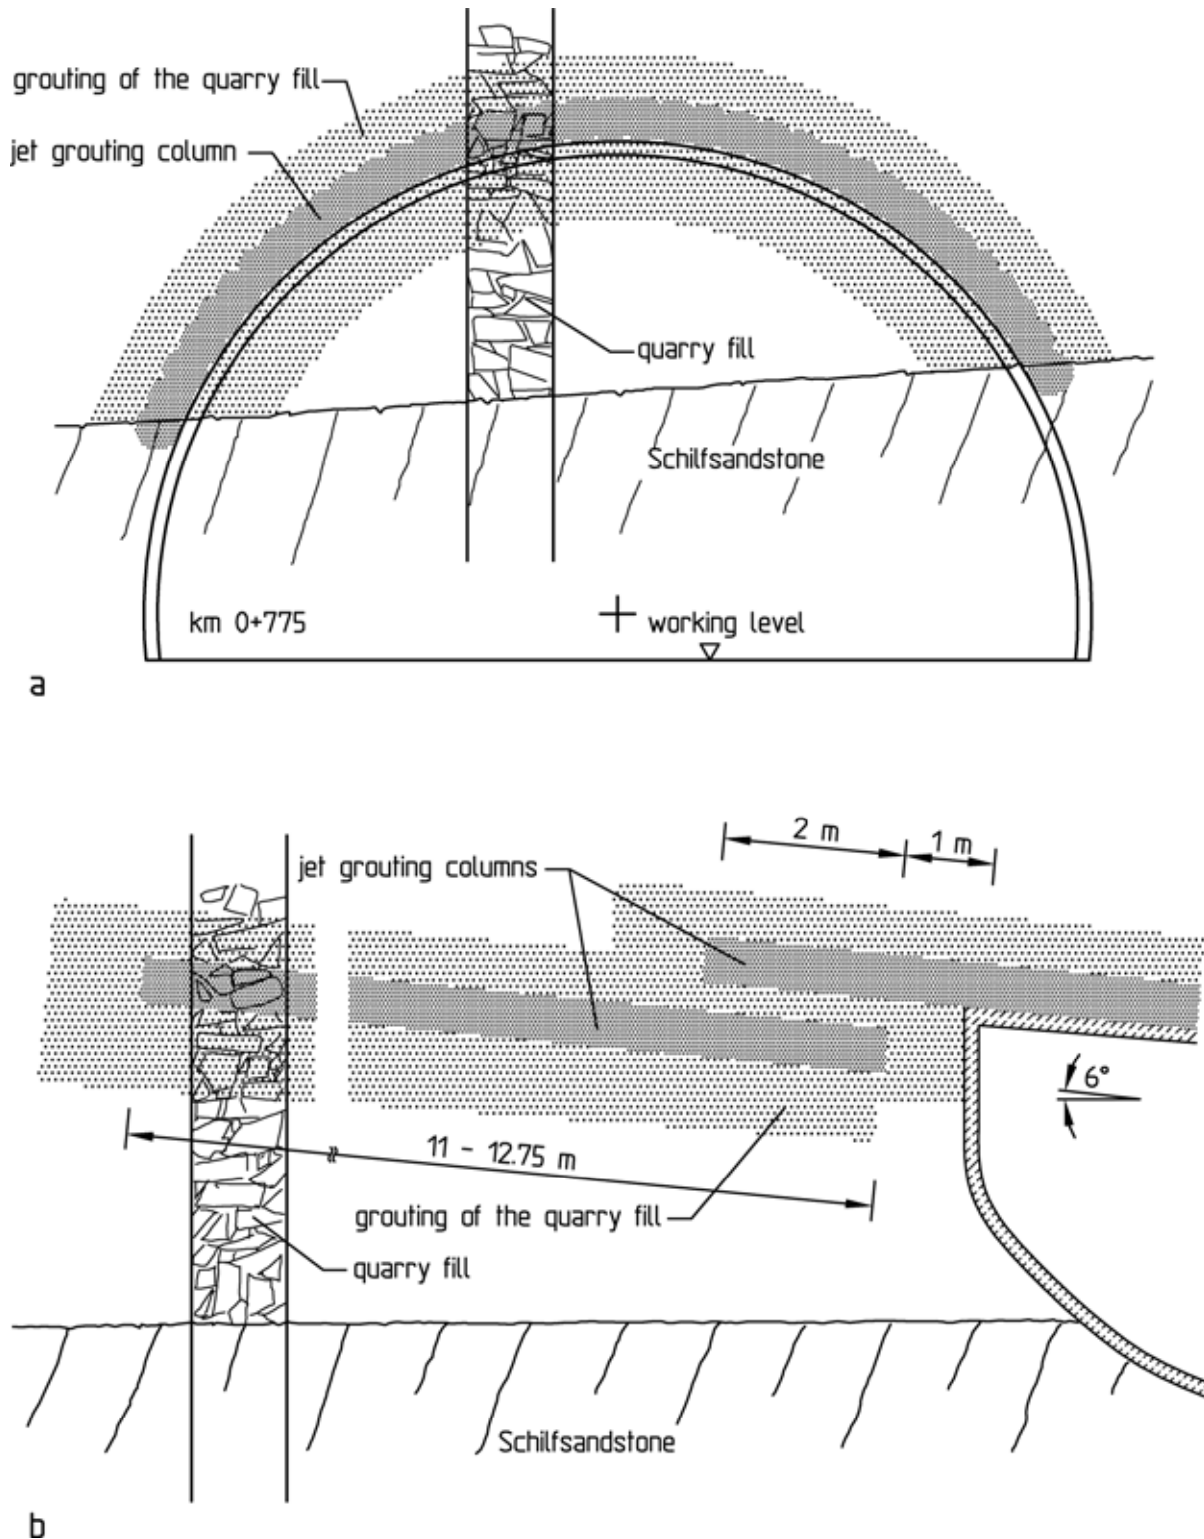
Advancing grouting of the quarry fill and jet grouting columns: a) Cross-section; b) longitudinal section
